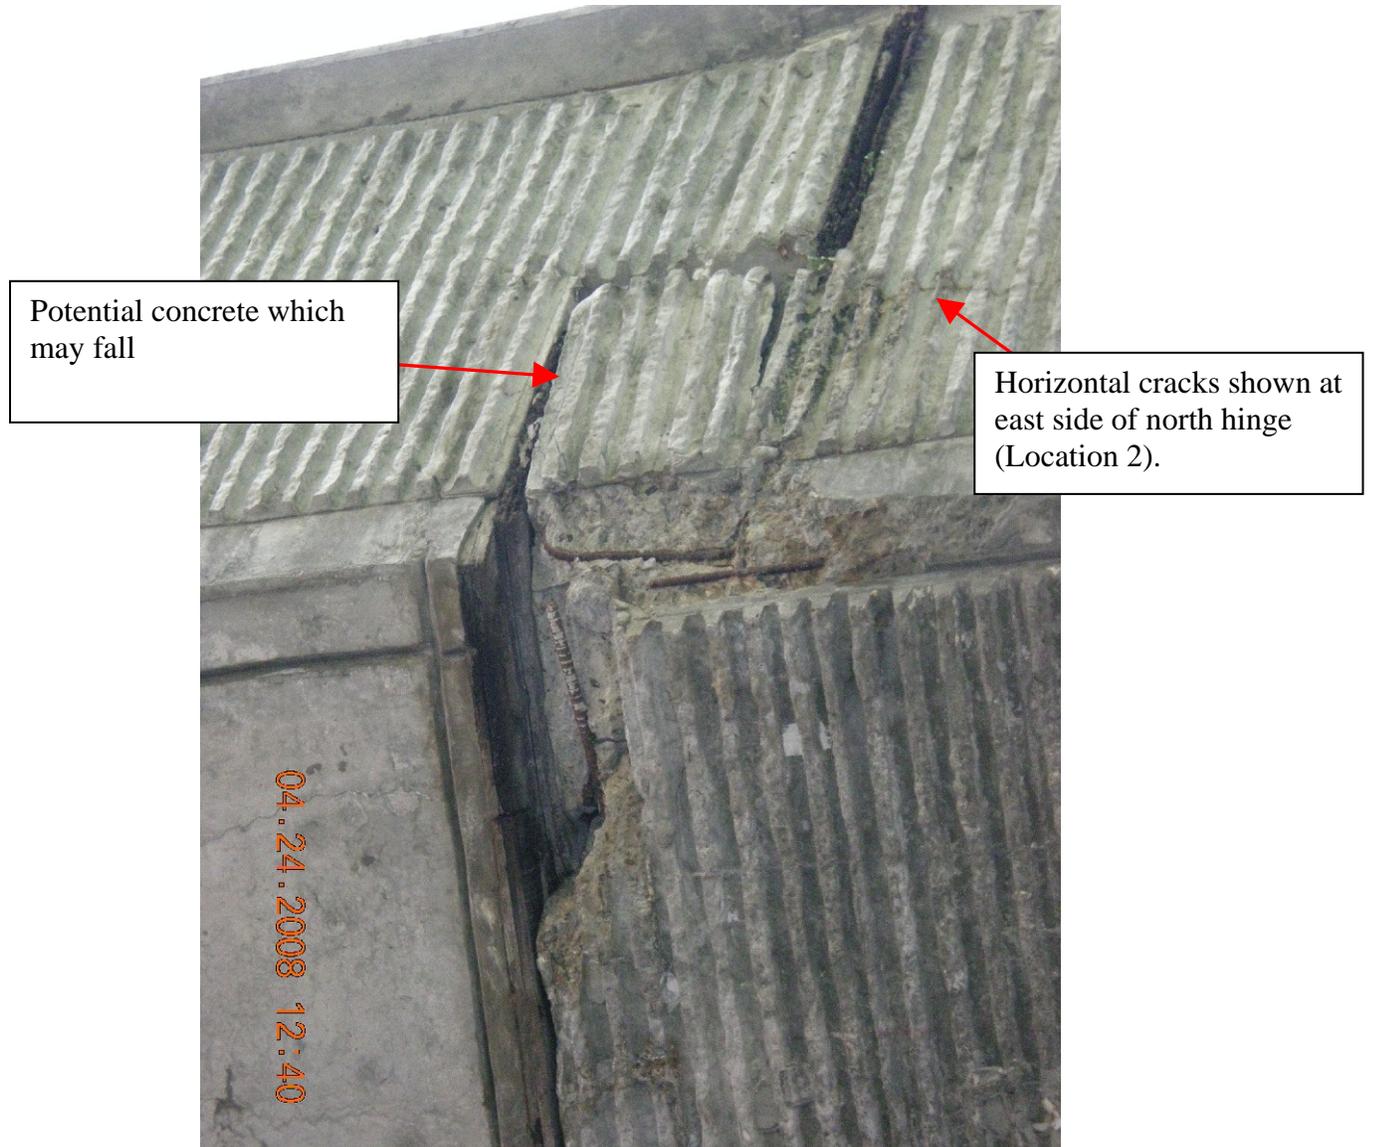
Location 2 Hinge showing horizontal crack and potential concrete which may fall
